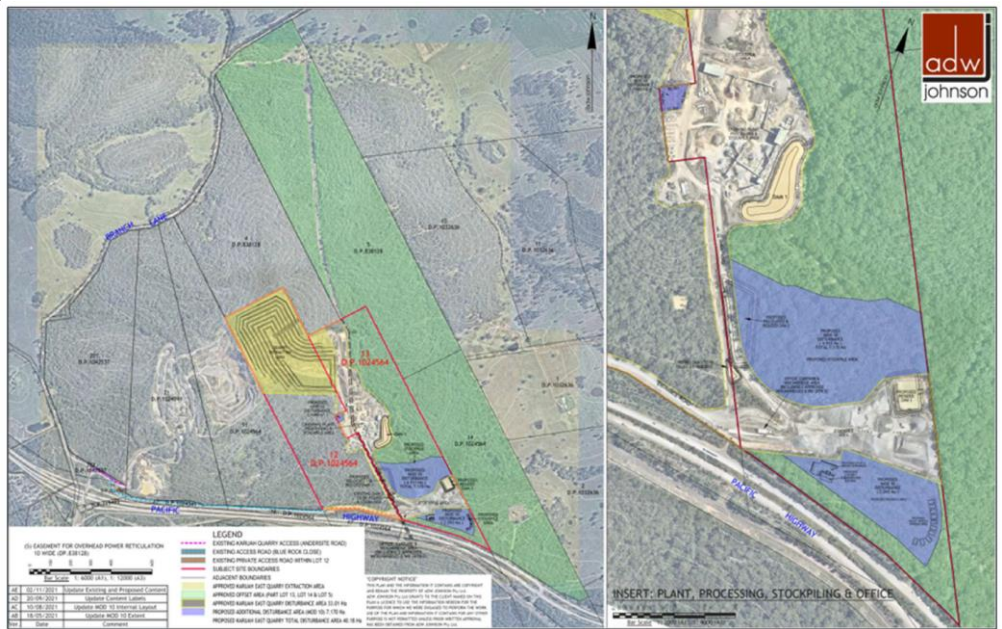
KEQ Proposed Modification 10 Plan [DRAFT]
